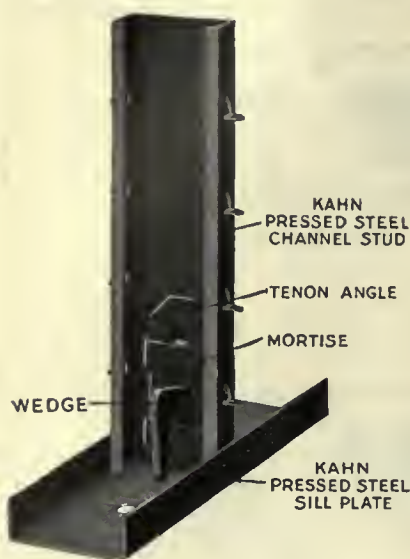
JOINTS IN STEEL-FRAME CONSTRUCTION
